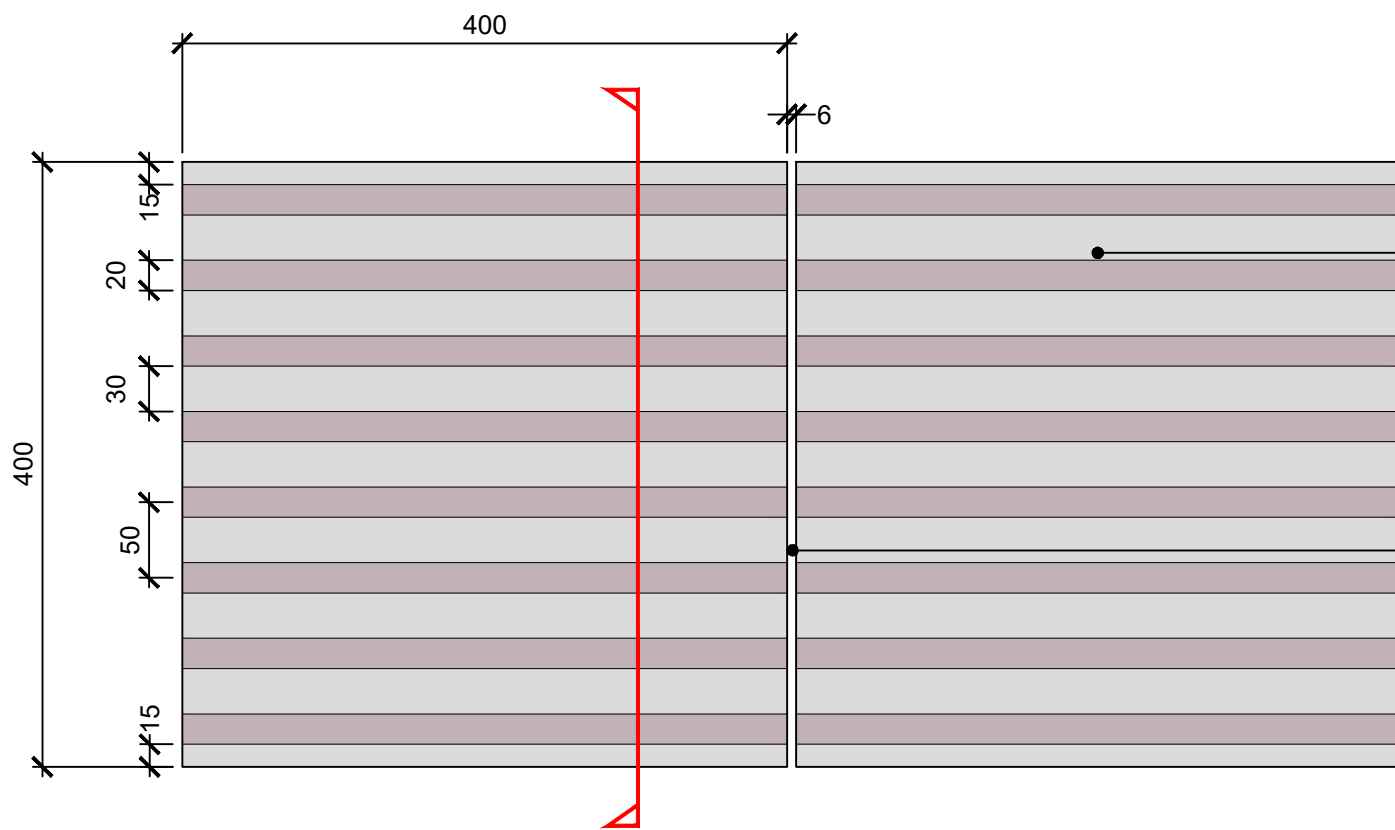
CONCRETE - SHOTCRETE IN-SITU
